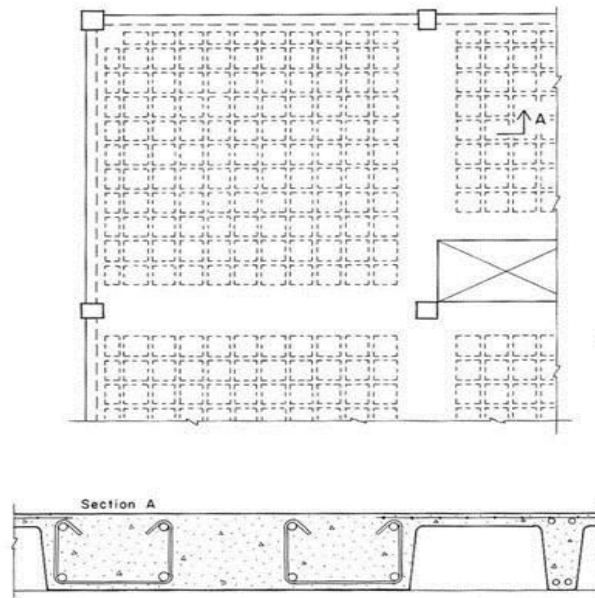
Waffle construction with column-line beams within the waffle depth
